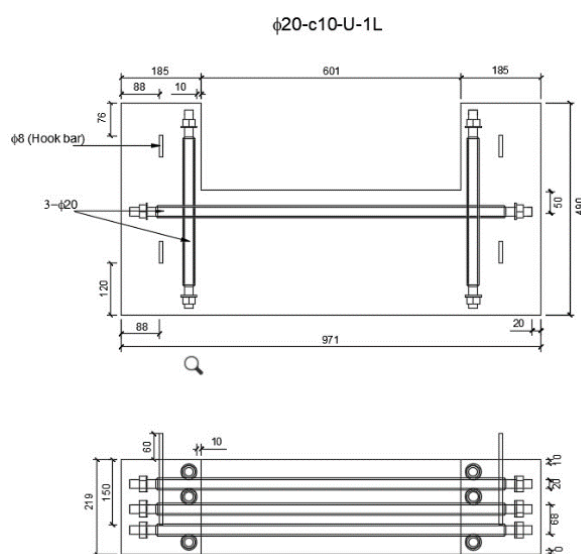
Typical reinforcement in specimens with a single layer of reinforcement
